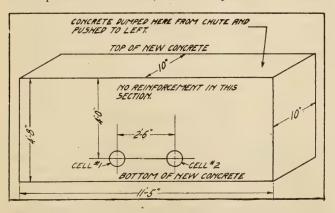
SHOWING LOCATION OF PRESSURE CELLS NOS. 1 AND 2, FIELD TESTS, DURING CONSTRUCTION OF REINFORCED CONCRETE BUILDING.
